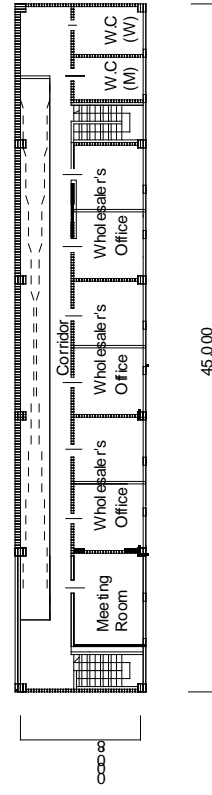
Layout Plan of NWM in Site B, Kathmandu
